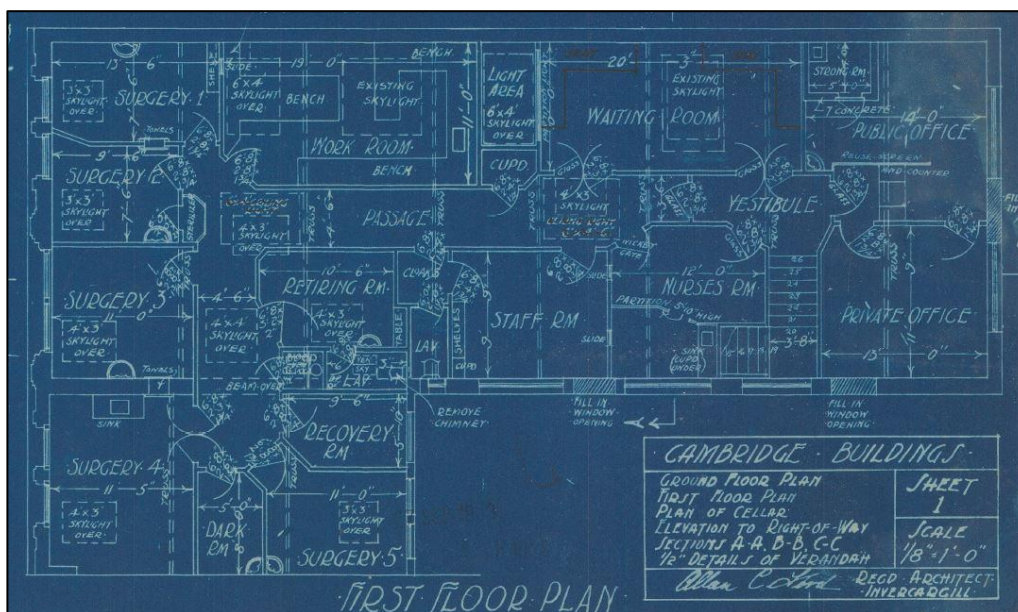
Detail from 1933 plan showing first floor layout of Tay Street Cambridge Buildings (Tay Street to left) (Ford, 1933).
